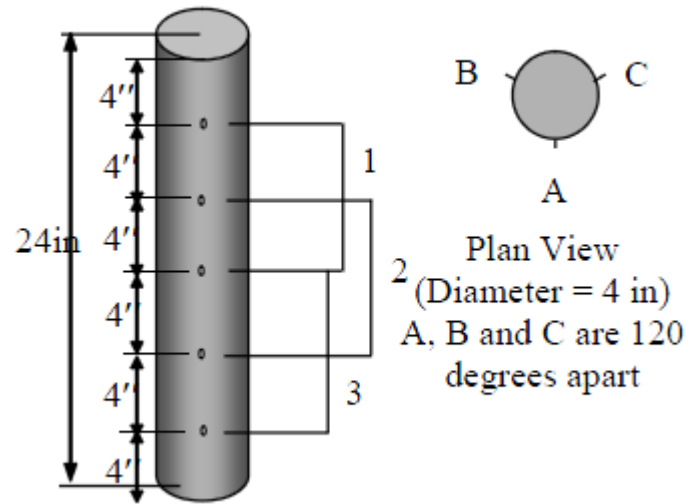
Shrinkage and Creep Specimens and DEMEC Point Arrangement (Myers and Yang, 2005)
